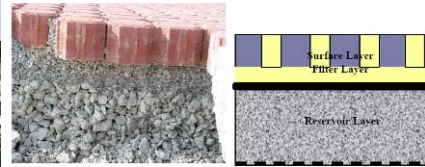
Typical Modular Paver PerVIOUS Pavement System Cross-Sections
